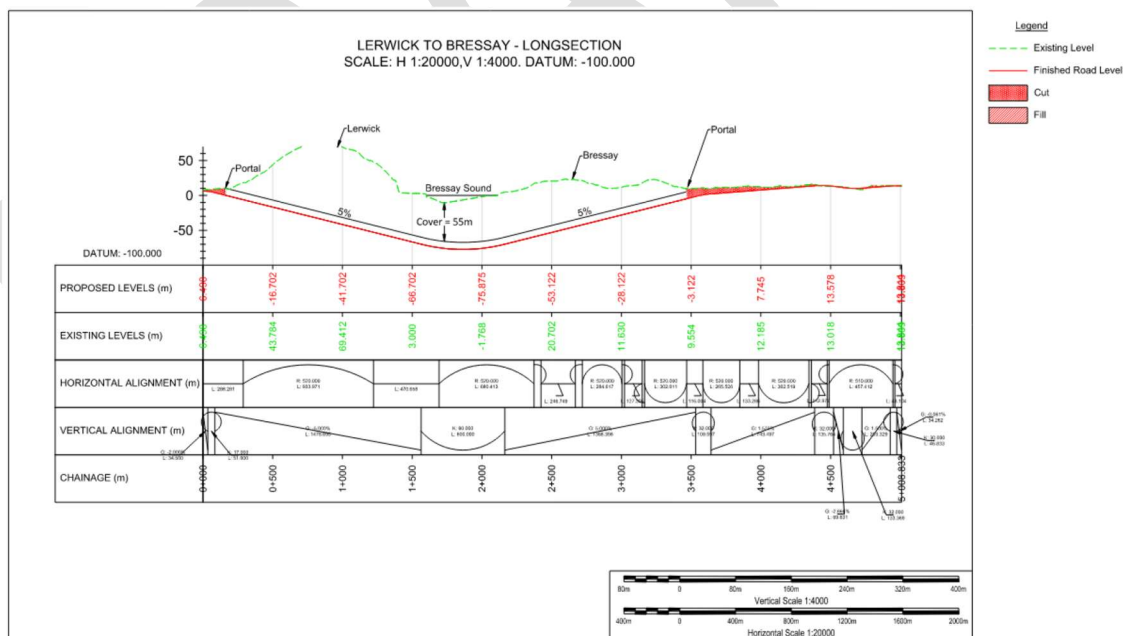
Vertical tunnel alignment from mainland Shetland to Bressay
